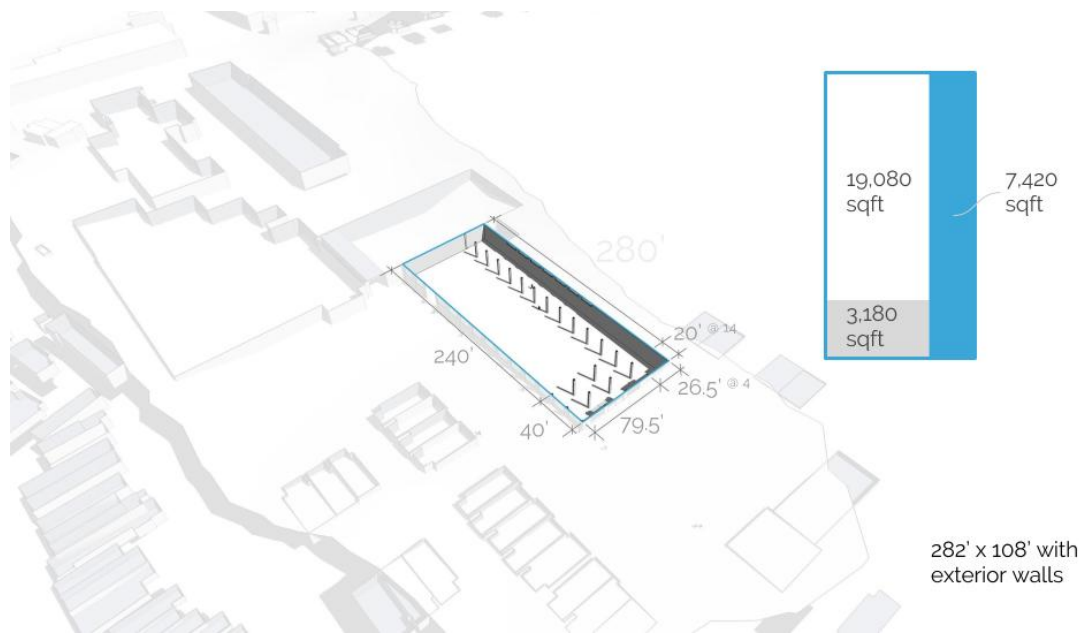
, Building Dimensions and Major Spaces (Source: Author)
